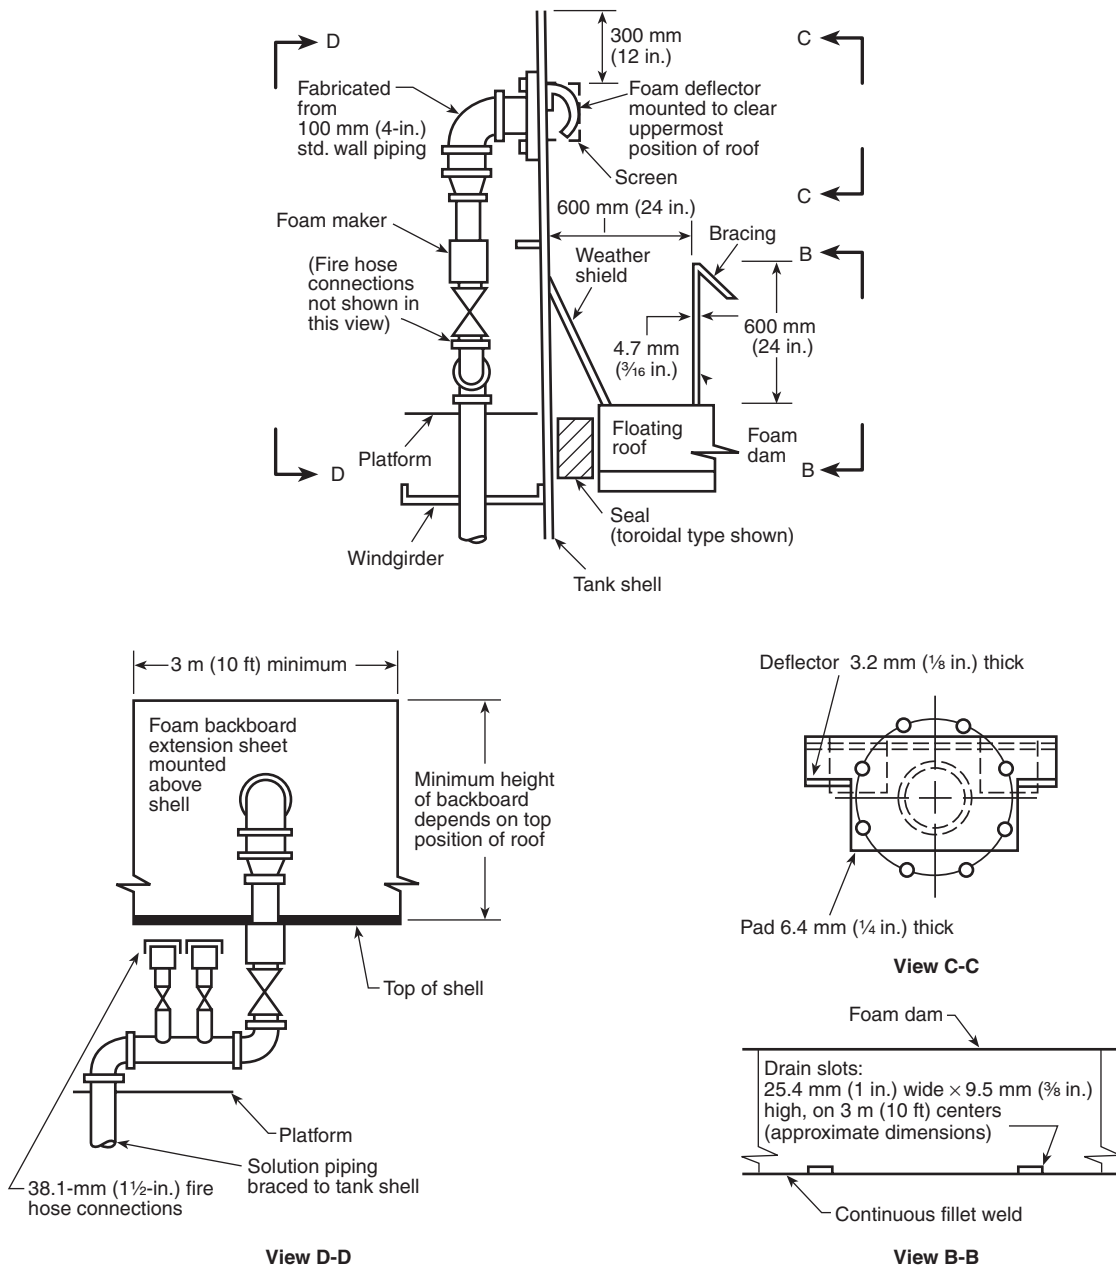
Typical Installation of Foam Handlines for Seal Area Fire Protection.
